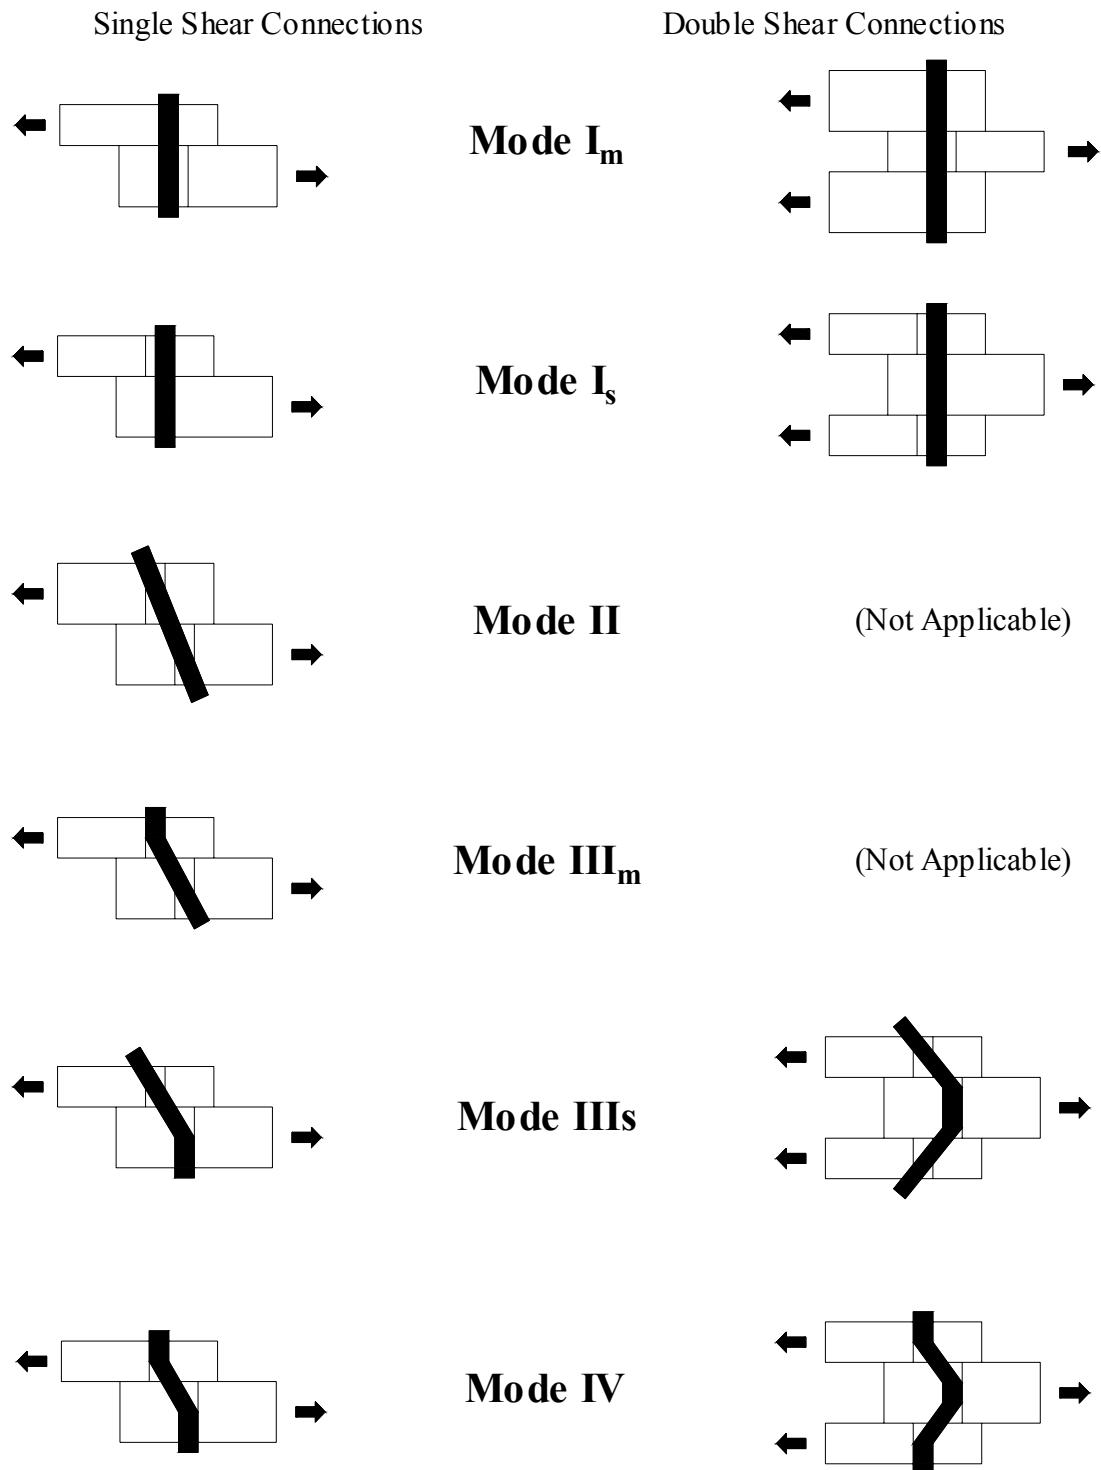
Connection yield modes for single and double shear connections (after AFPA, 1997).
